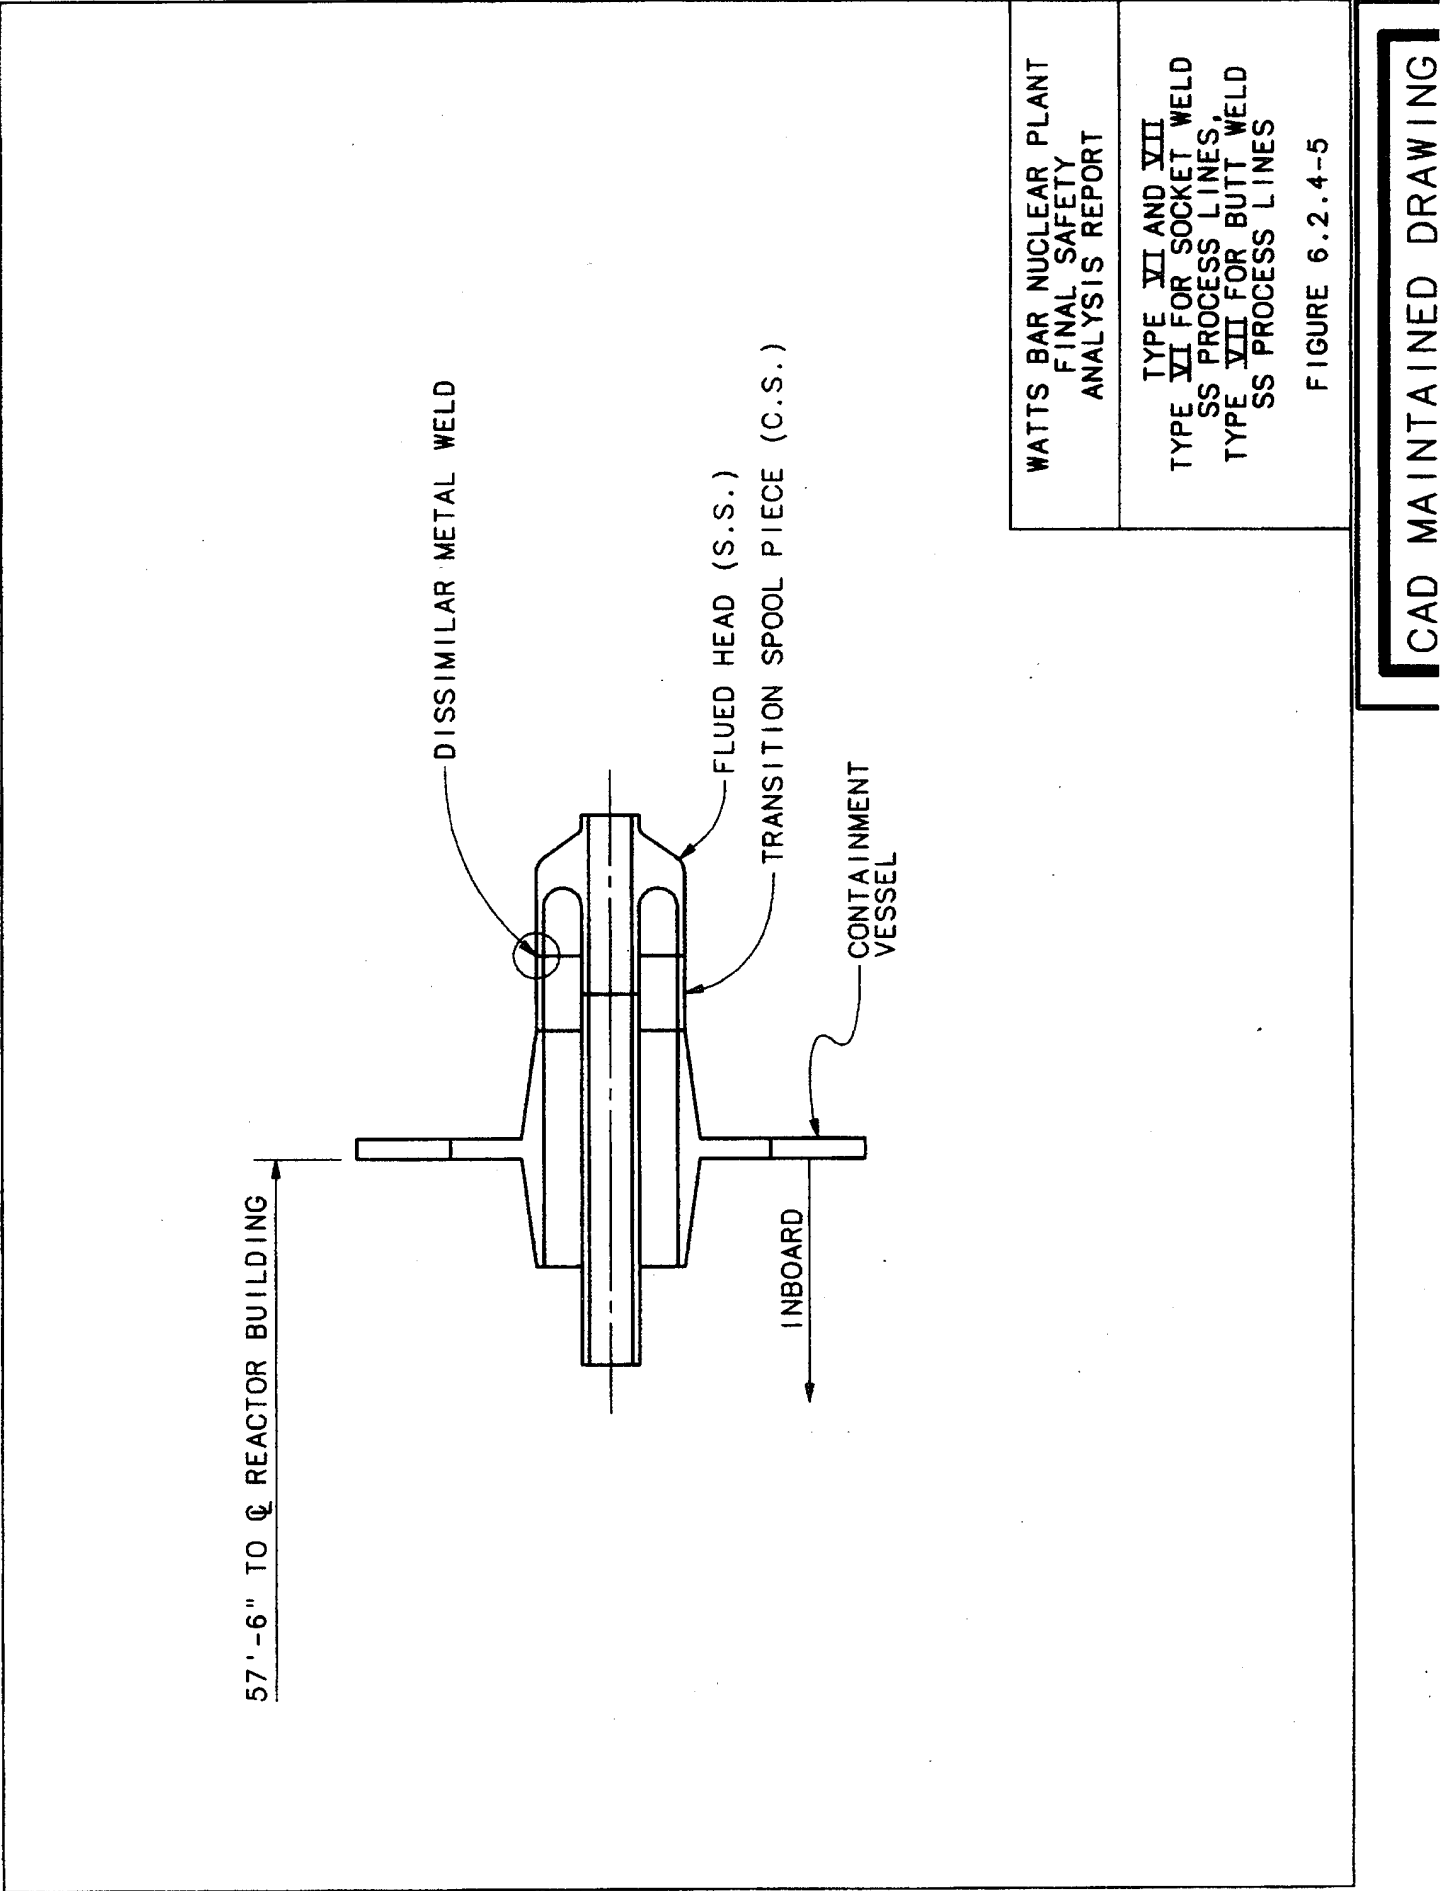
Type VI and VII (Type VI for Socket Weld SS Process Lines, Type VII for Butt Weld SS Process Lines)
